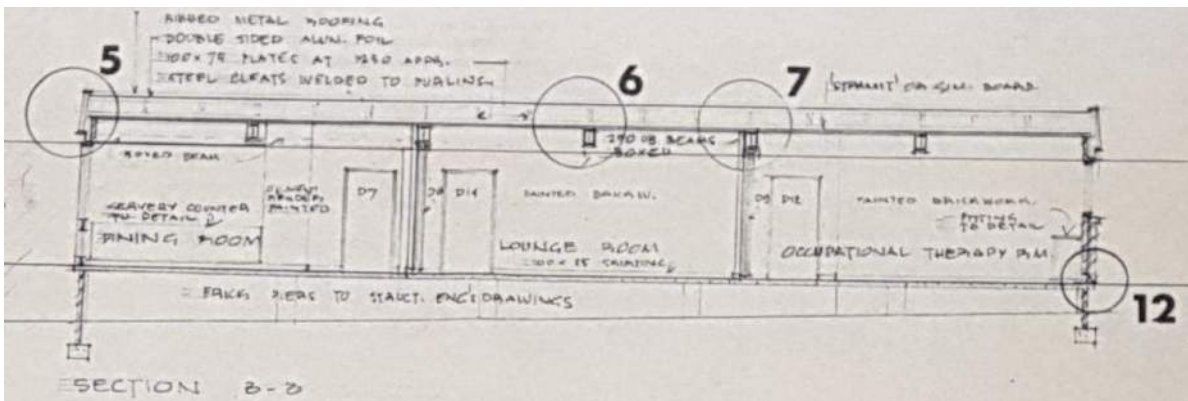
Existing architectural drawing showing section through building.
